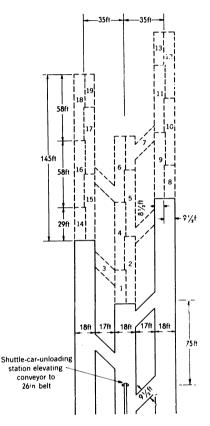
Main entry development with boring-type continuous miner – shuttle car haulage to conveyor (Mine 16).⁽³⁾
